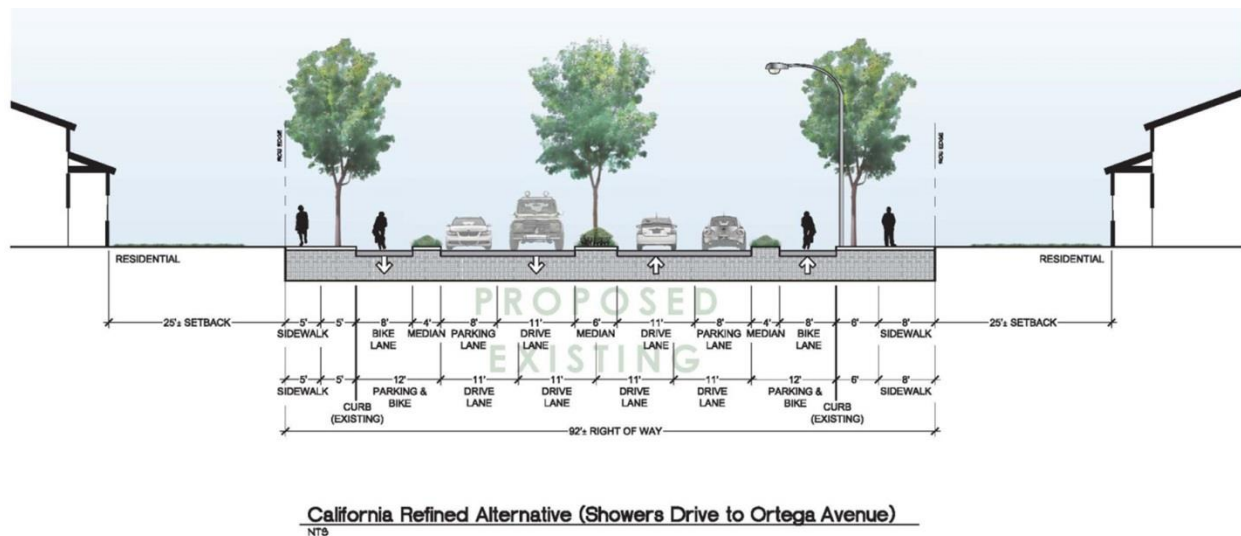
Refined California Street from Showers Drive to Ortega Avenue
